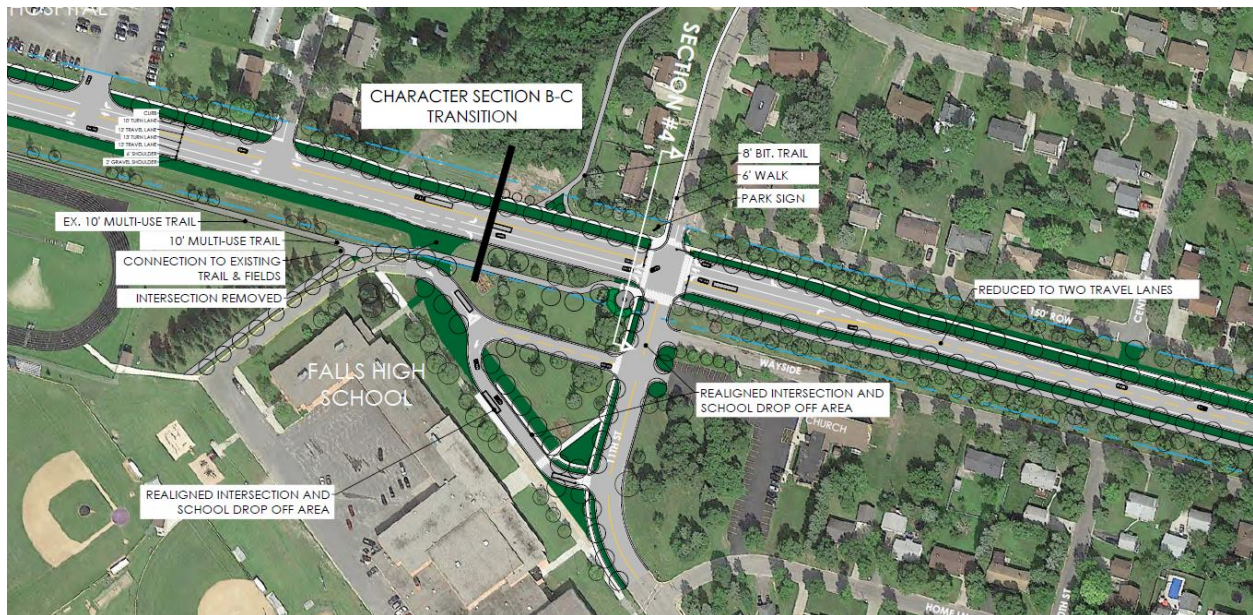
Schematic of proposed 11<sup>th</sup> Street rerouting
